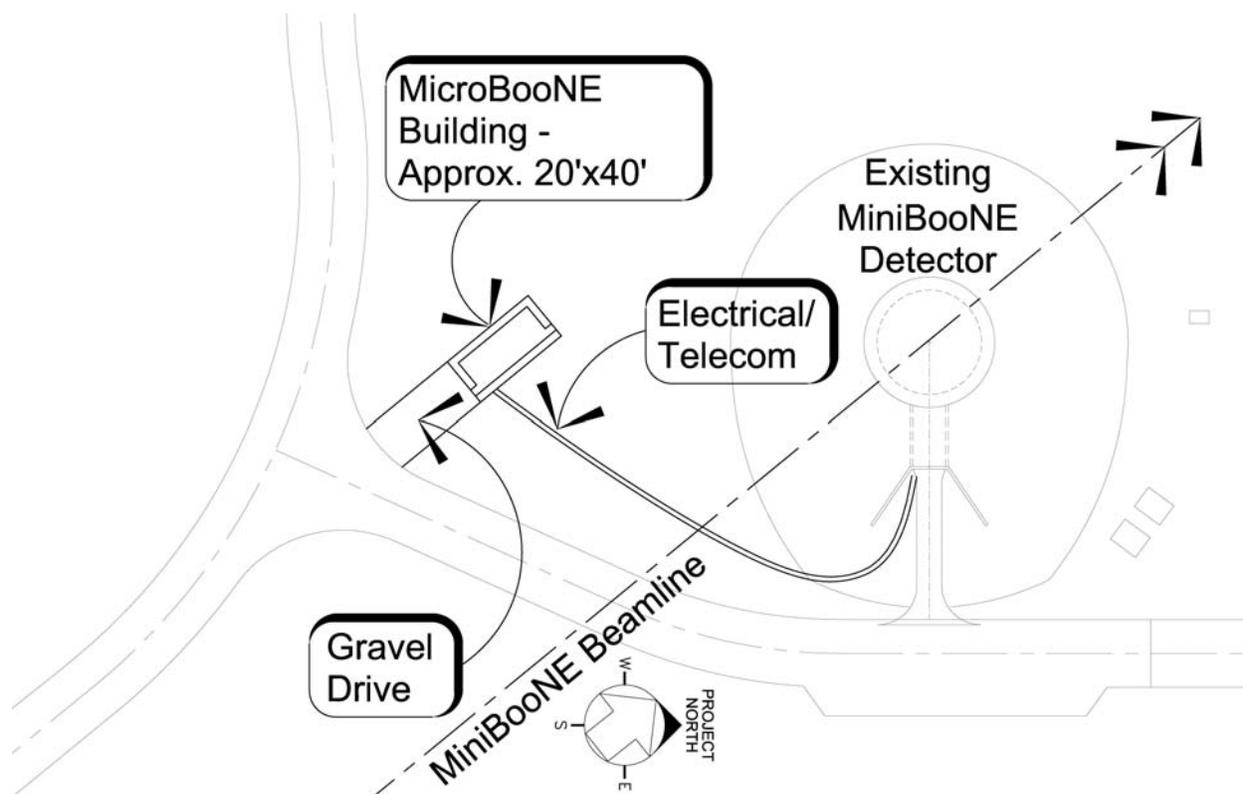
Location Plan of MicroBooNE Shield Block Building
